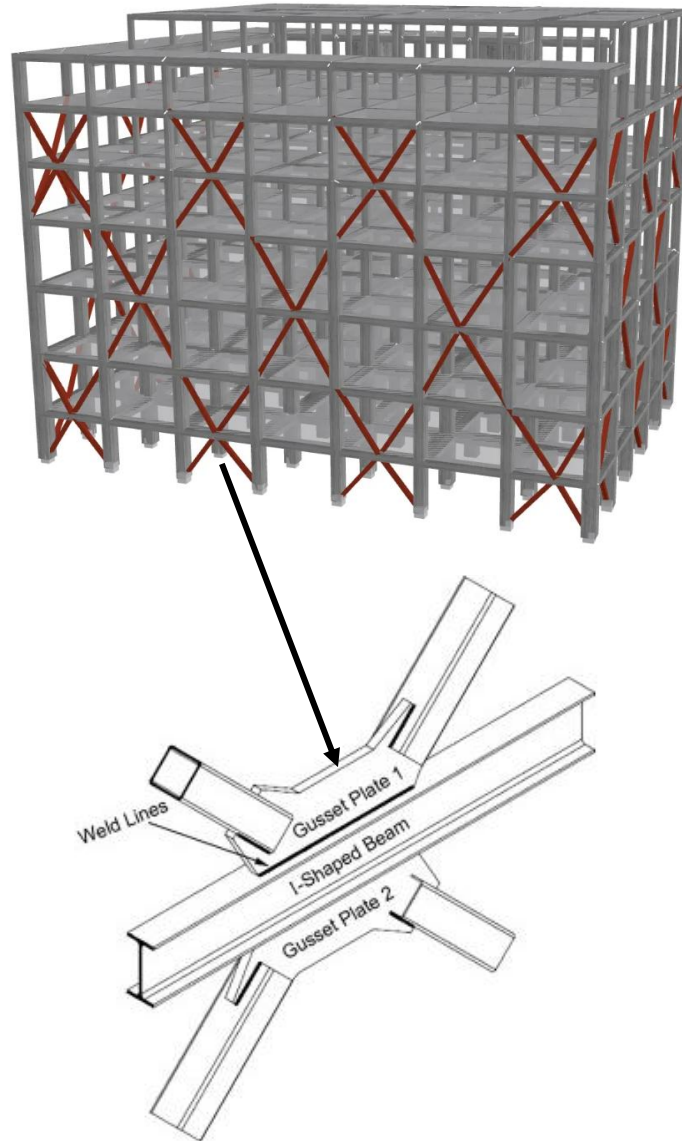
Commonly used wide flange beam to HSS brace connection in two-story configurations (Roostaeyan et al., 2020) (Seismosoft, 2022)
